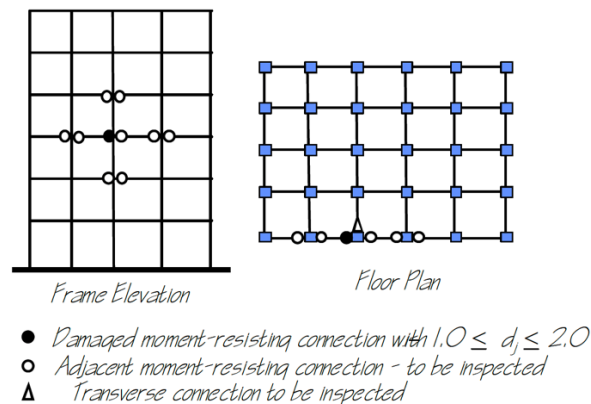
Inspection of Connections Adjacent to Damaged Connection ($1 \leq d_j \leq 2$)
